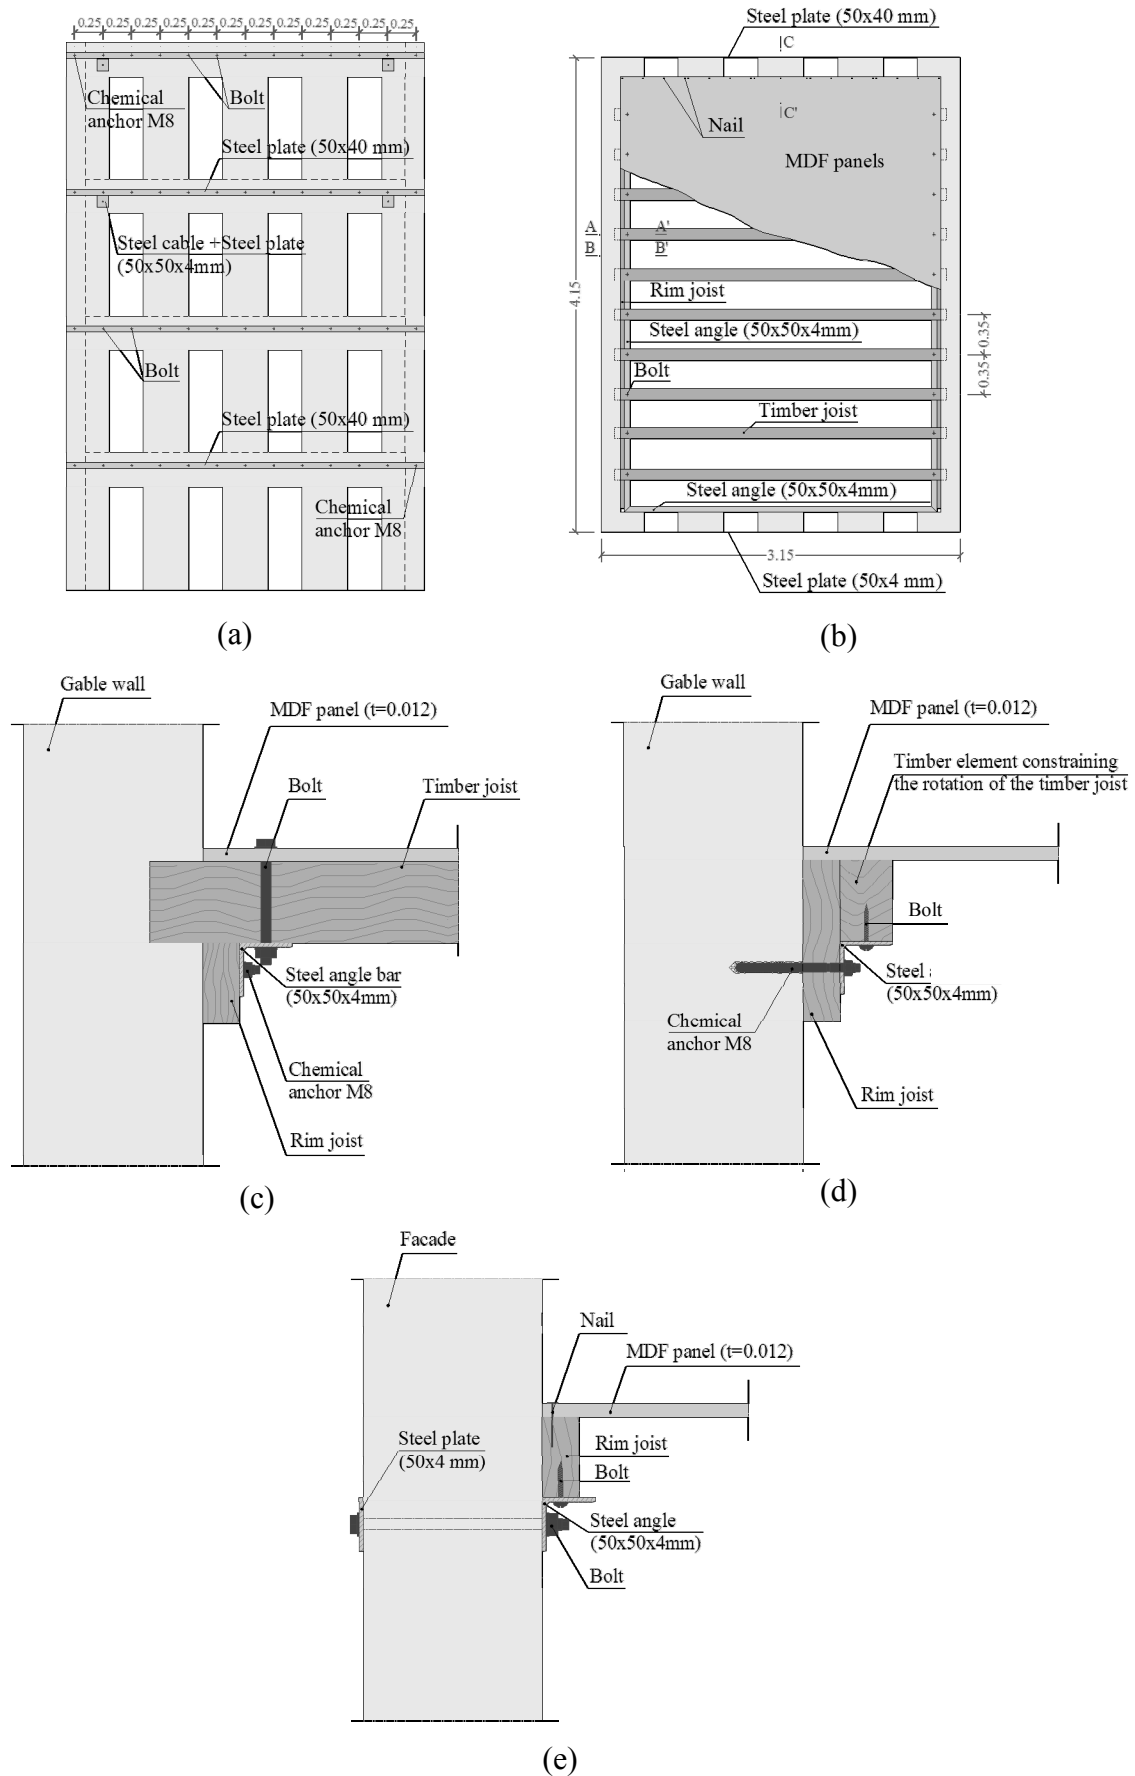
Strengthened mock-up: (a) facades; (b) plan; (c) section AA'; (d) section BB'; (e) section CC'. (Dimensions in meters).
